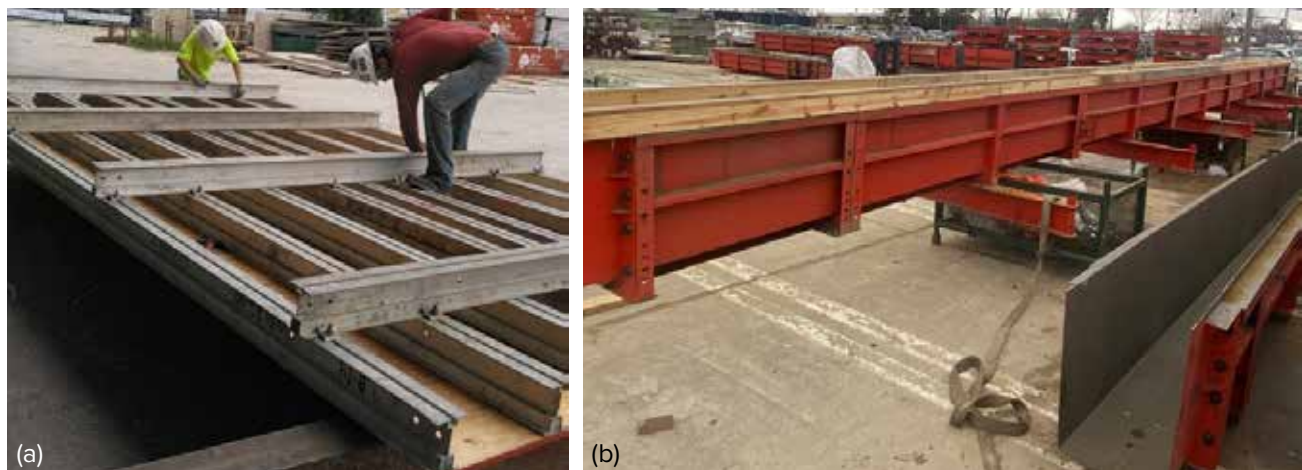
Workers engage in the make-up of formwork: (a) a gang panel using standardized components; and (b) a 60 ft long steel beam form with drafted sides. (Images courtesy of Ceko Concrete Construction.)
